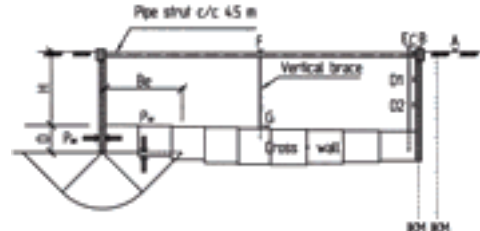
Typical cross section Lilla Bommen tunnel (after Karlsrud et al, 2005)
